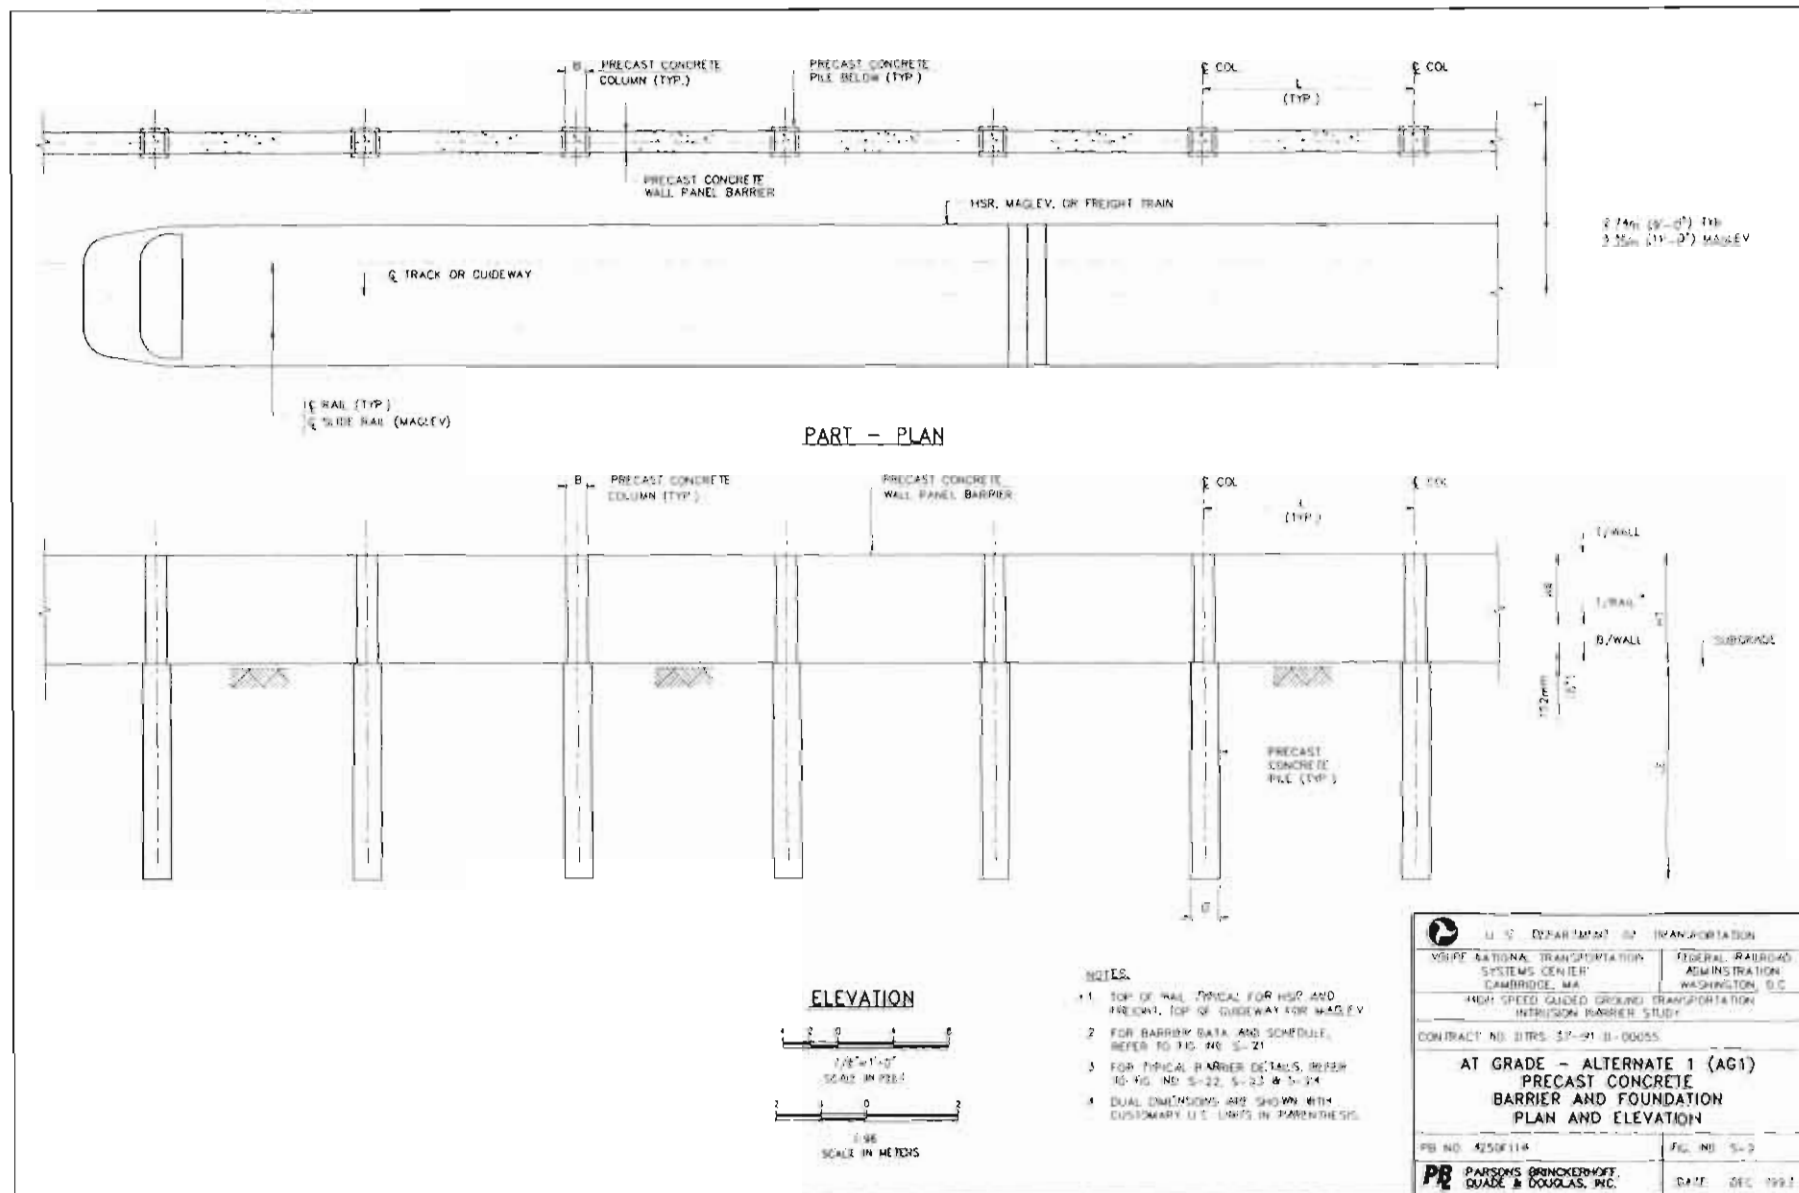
AT GRADE ALTERNATE 1: PRECAST CONCRETE (P/C) WALL AND P/C FOUNDATION - PLAN AND ELEVATION
